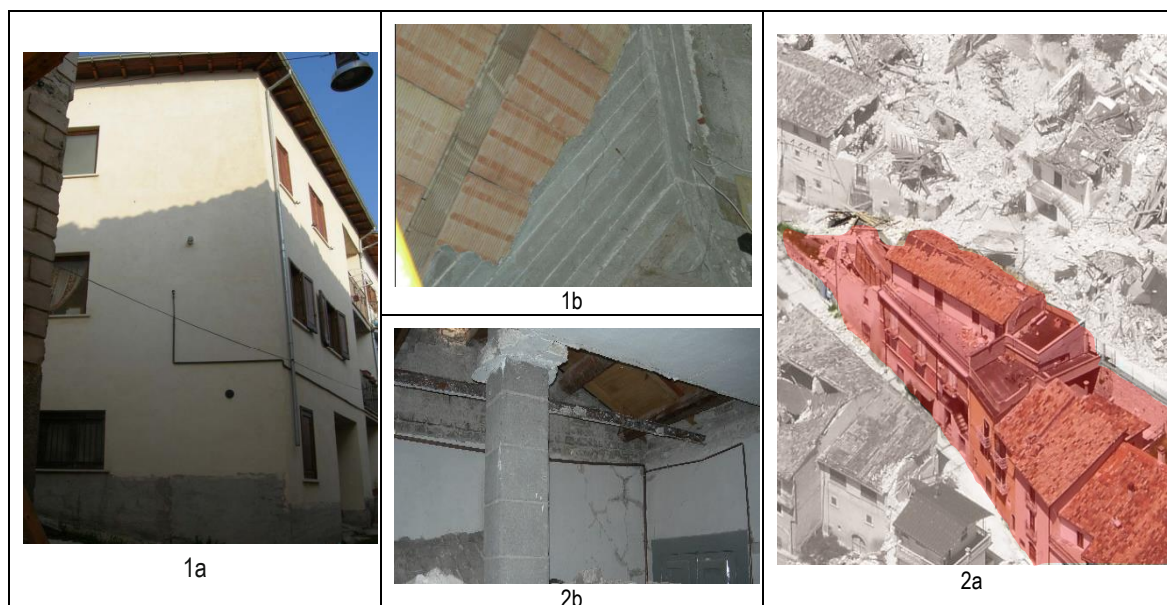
09-160 s.u.1 (1a) and its reinforced concrete slab (1b). 18-163 ss.uu. 2-3 (2a) with collapsed flexible floor (2b).
